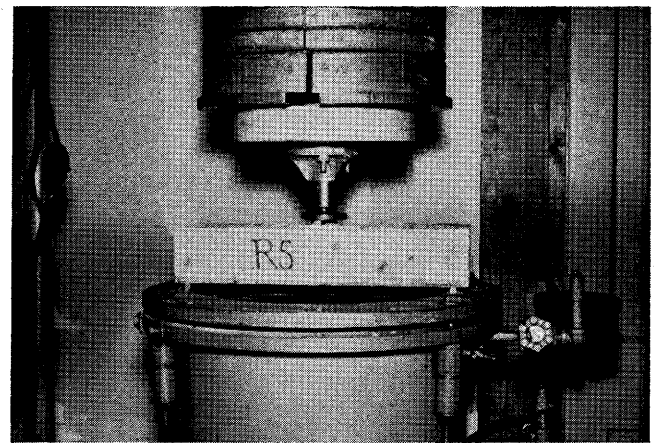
Arrangement of Concrete Prism Specimen For Fatigue Testing.
